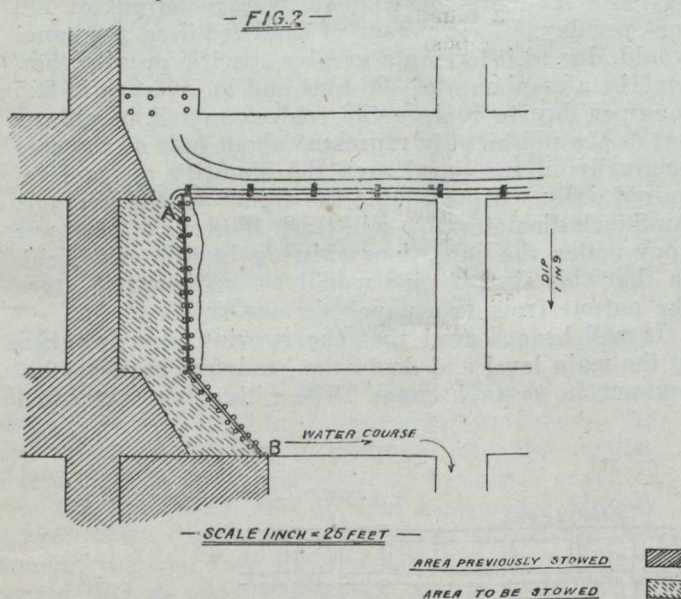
shows an enlarged view of a cut-through about to be stowed. The stowing material and water pour into excavated area at point "A." From there to point "B" two parallel rows of props are set about two inches apart with 3 ft. between each couple, one inch boards are placed between the two-inch space forming a wall from roof to pavement, and this wall is backed with bratticecloth. As the stowing material and water flow into the space, the solid material gradually settles and the water drains off through the bratticecloth and spaces in the boards, leaving after a day or two, a hard compact filling, through which roadways can be driven. After a few days the props, boards and brattice are withdrawn and are ready for further use. The water will run through the various crosscuts till it reaches the water level and finally the sump from which it is pumped back again to the surface. In the case of using sand very little trouble is experienced in clarifying the water. All that is necessary is to lend it into the bottom of a wooden tank letting it overflow into the sump. The tank can be cleaned out after flushing ceases. Where material of a clay nature is used for stowing a series of silt recovery boxes would be required.
